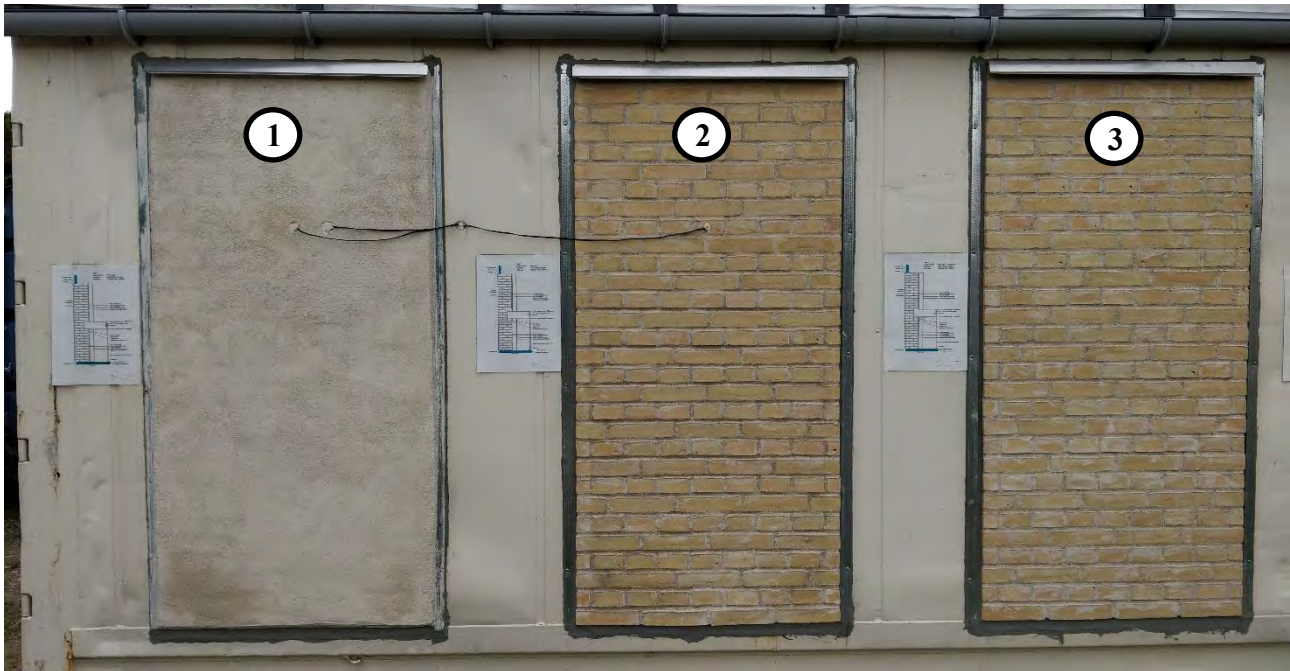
The exterior wall treatments. 1) Rendered. 2) Bare brick. 3) Bare brick with hydrophobization.
